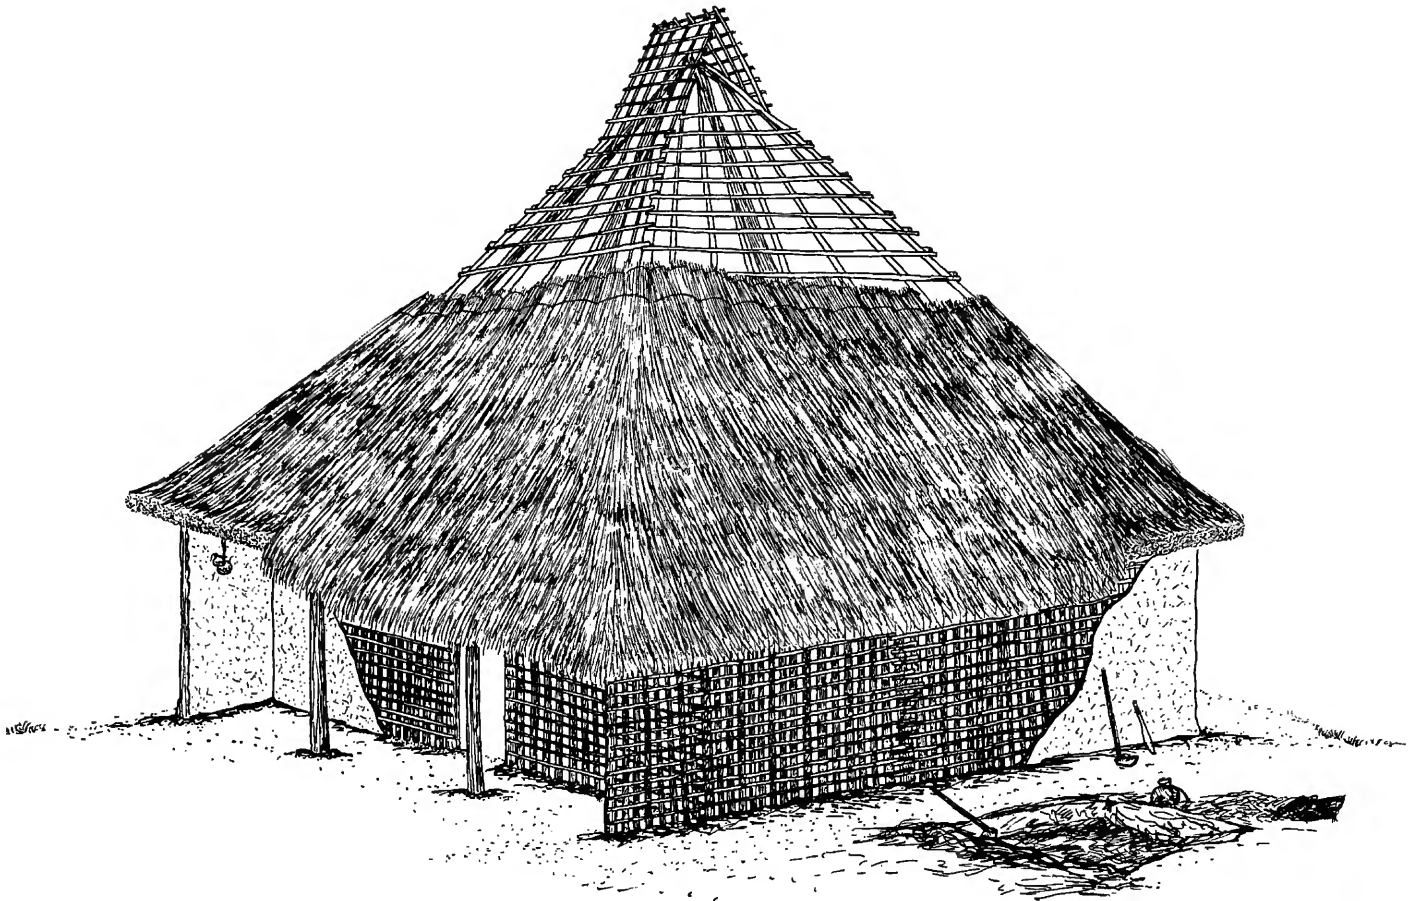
Elevation of traditional house in construction. Note how the construction of the smoke hole forms an even steeper pitched roof over the apex of the main roof. The lowest course of thatch has been partially trimmed. The pit on the side of the house provides the plaster of mud, pine needles and water.
